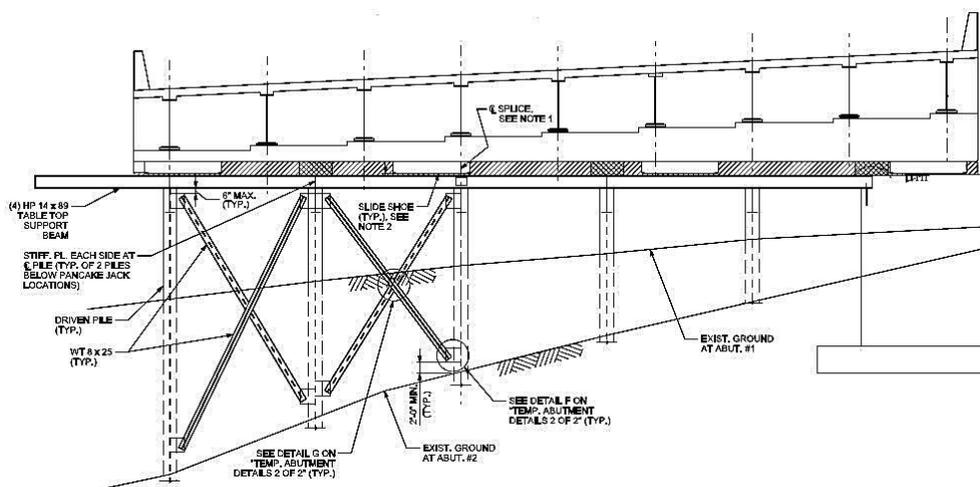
Side view of the I-80 Summit Park EB bridge temporary substructure
